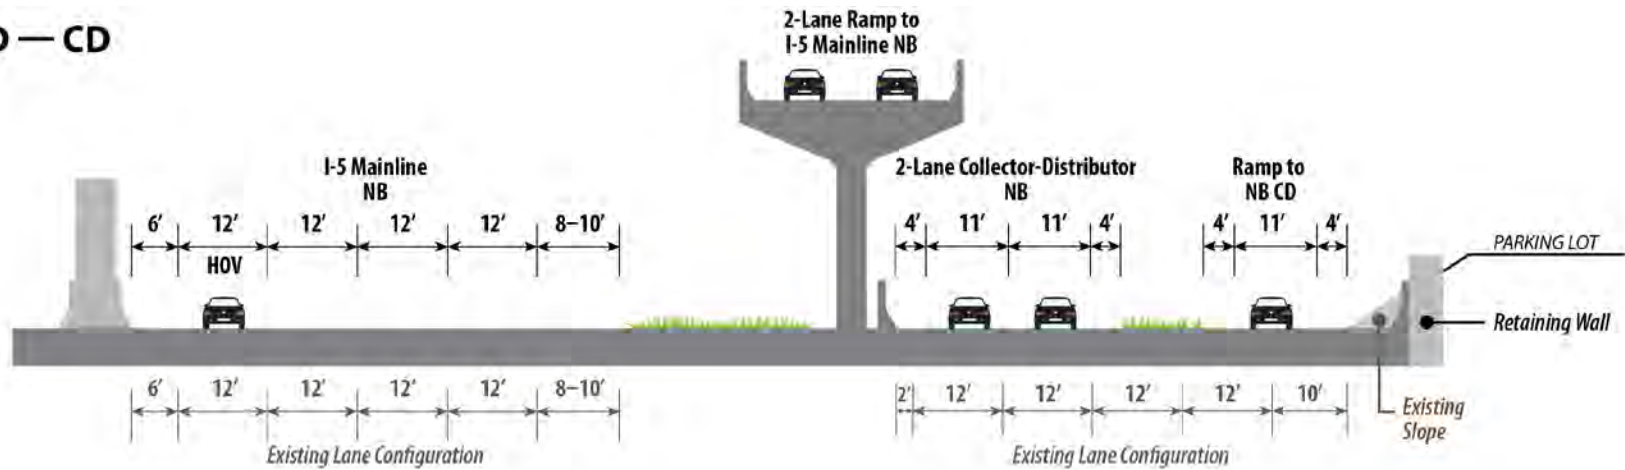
S 56th Street Practical Design Option 3 – Retain Bridge, Implement CD Roadway
